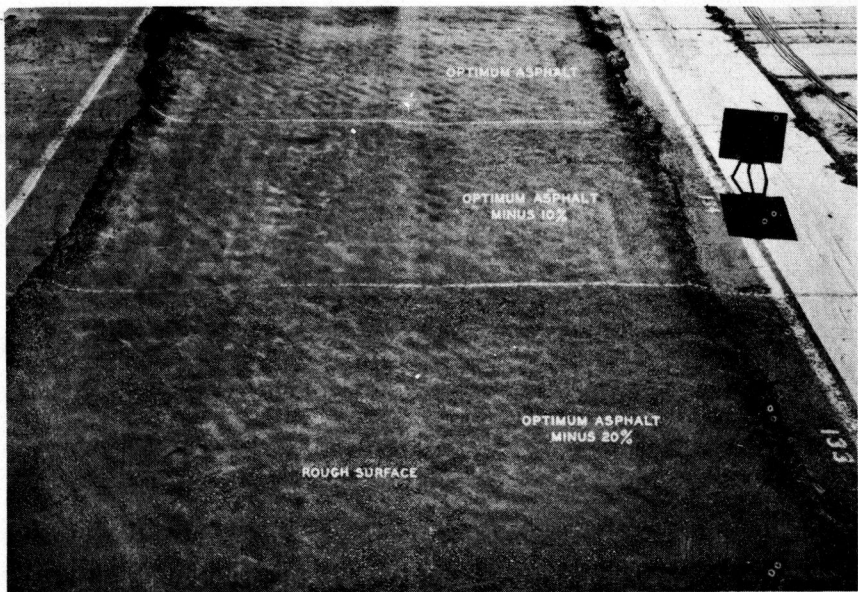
View Showing Pronounced Case of Condition Designated as "Rough Surface." Photo also Shows Upheaval at Sides of Traffic Lane Section 5A-1, Mix 10, 2024 Coverages, 15,000-lb. Lane
